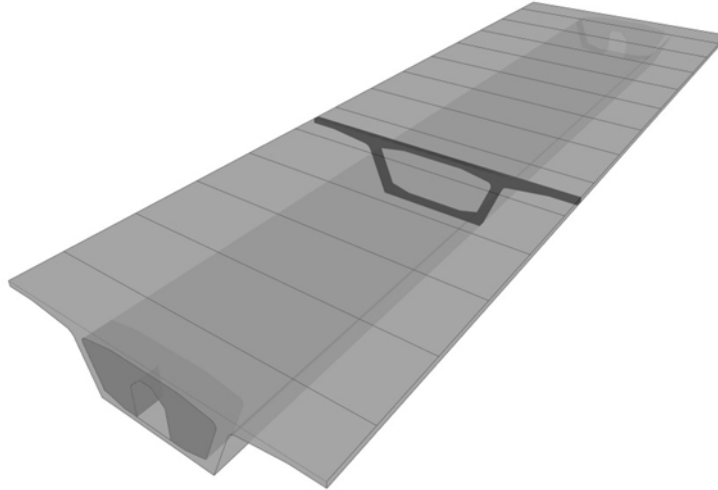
Typical Single-Cell Box Girder Span with Cross Section Defined at Mid-Span
